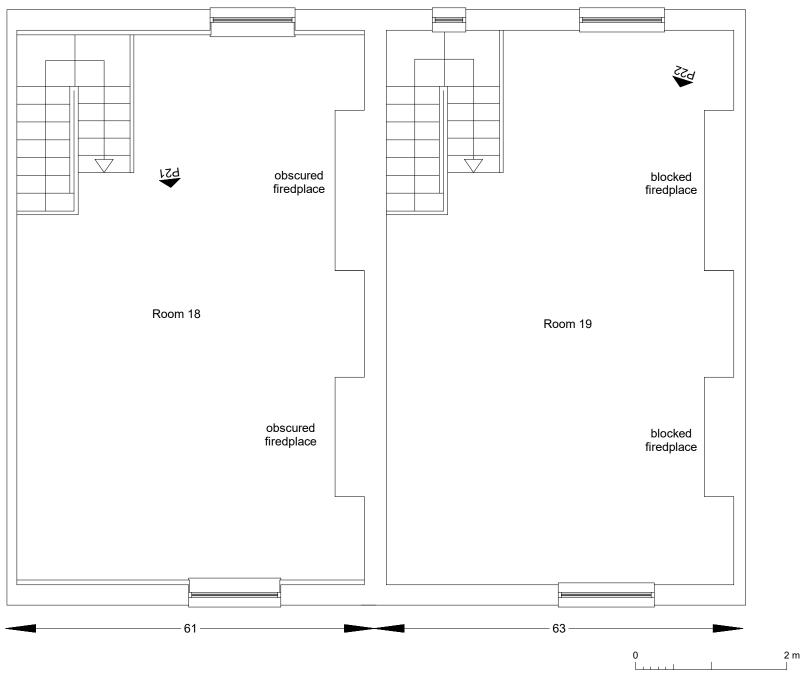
Second floor plan. Location and direction of photographs reproduced in text shown.
